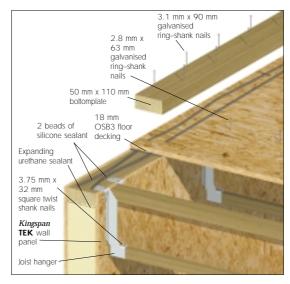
INSTALLING BOTTOMPLATE OVER FIRST FLOOR DECK (JOIST HANGAR DETAIL)
